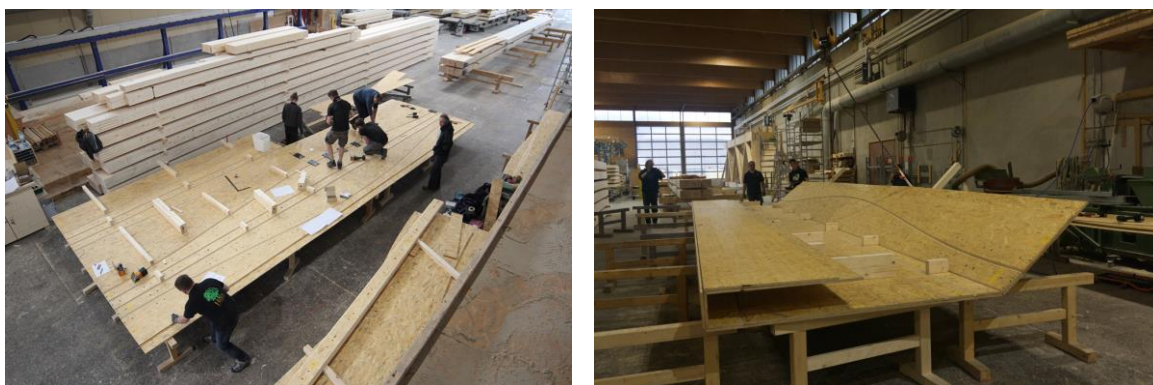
the assembly of the plates to one large “sheet”(left) and the folding process to form a closed cross section (right)
